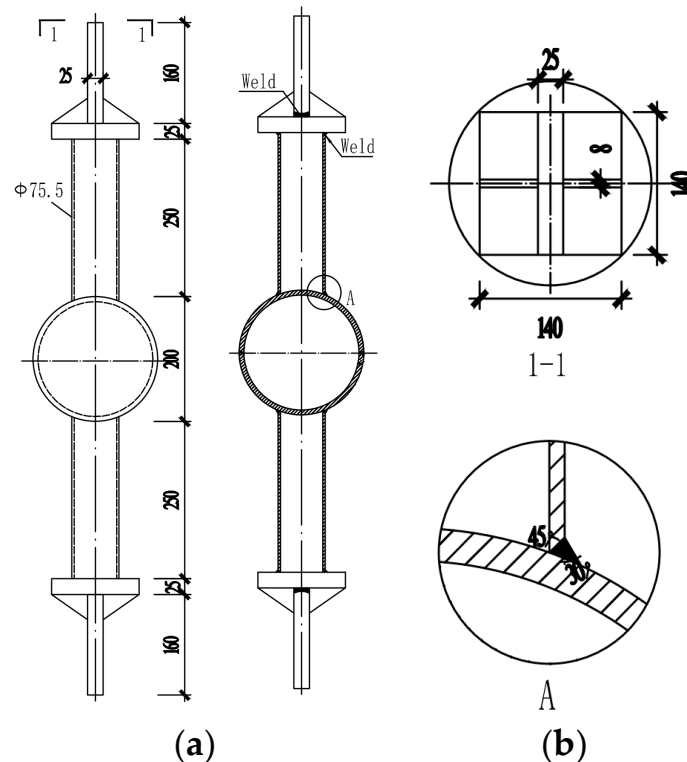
Size of specimens. (a) Front view; (b) Vertical view and welding details.
